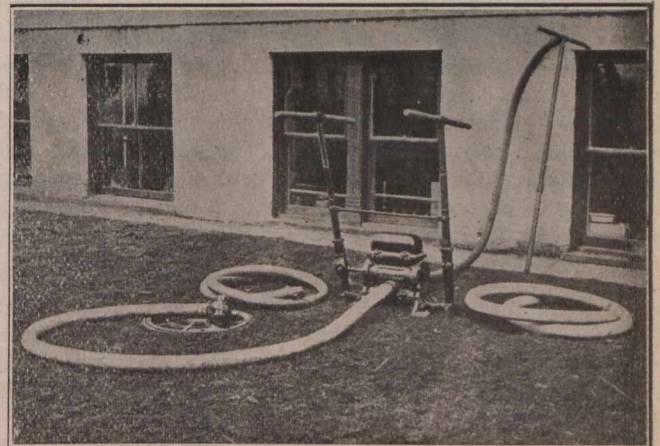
Wash-Drill Outfit for Testing Foundations.
